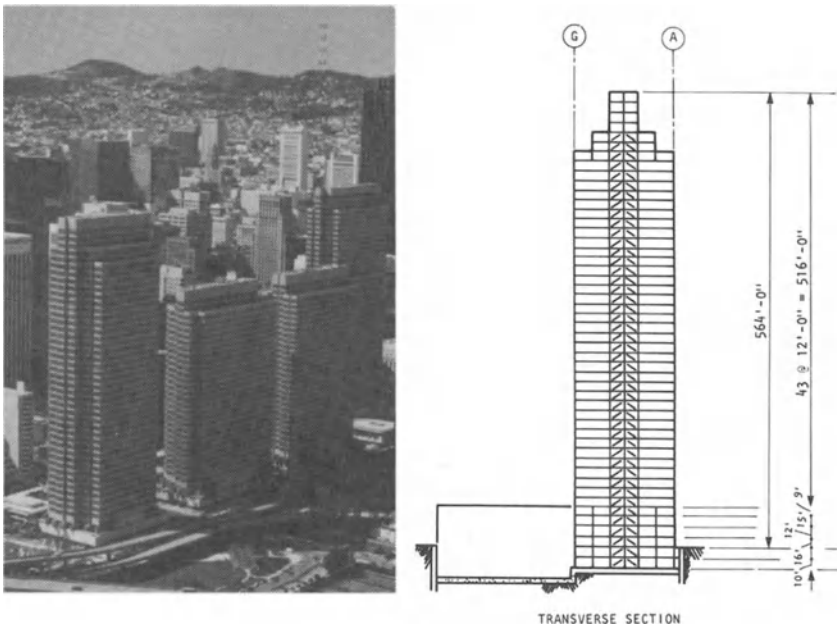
Group of four similar Embarcadero Center Buildings, San Francisco (1980). Moment-resisting frame of 45-story building in foreground is stiffened with eccentric bracing in transverse direction as shown at right (Courtesy: URS/John A. Blume & Associates.)
